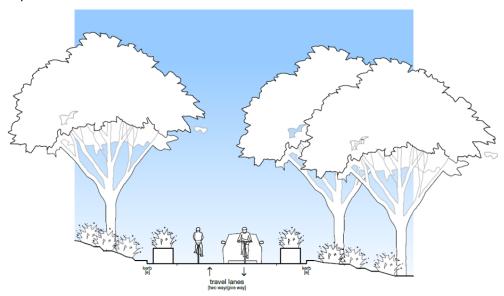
Proposed cross-section for The Serpentine (two-way give way)
